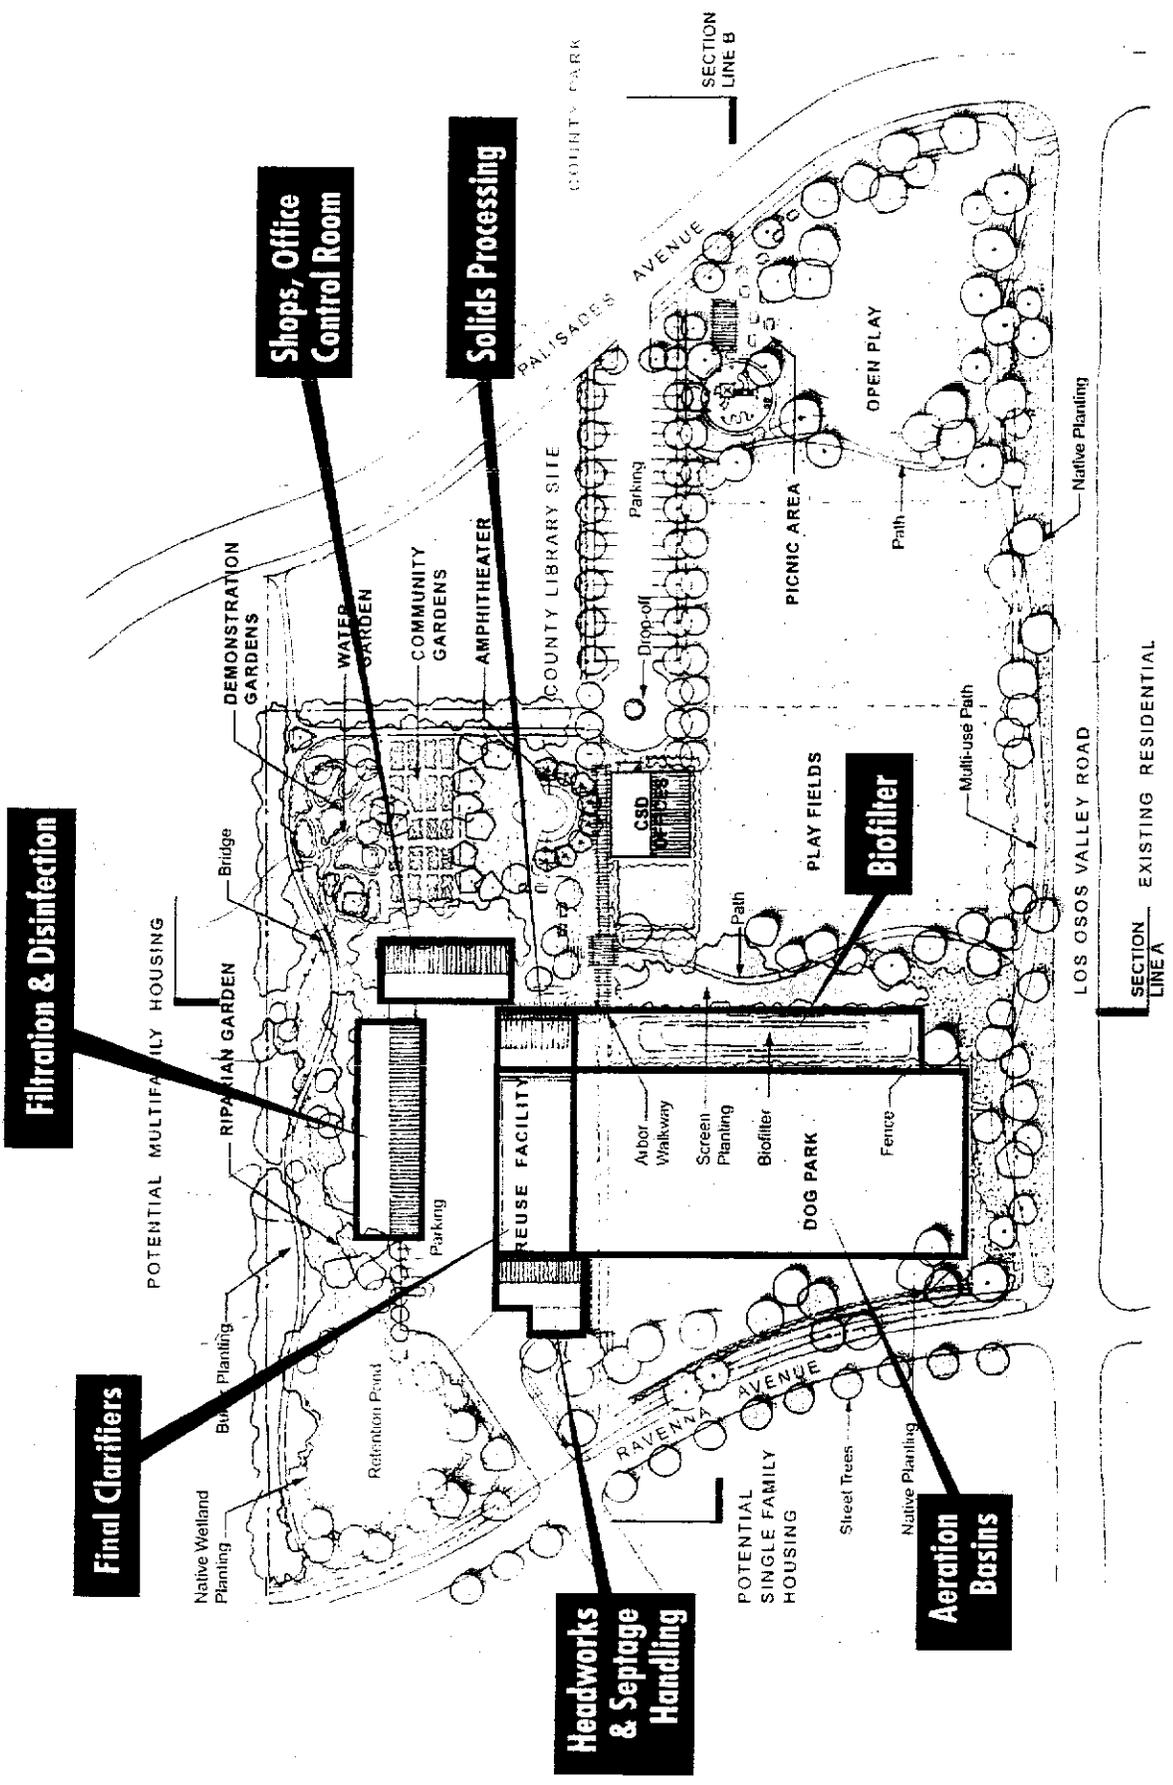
Conceptual Site Plan for Treatment Facility Site
